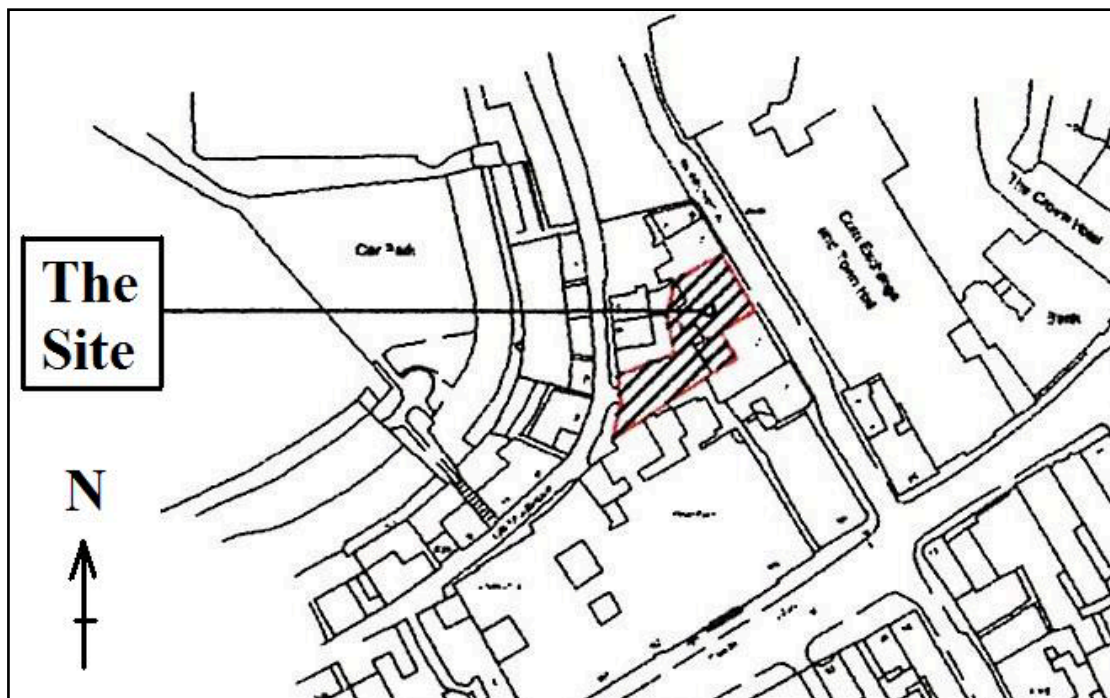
3a Fisher Street, Lewes: Site Location Plan
